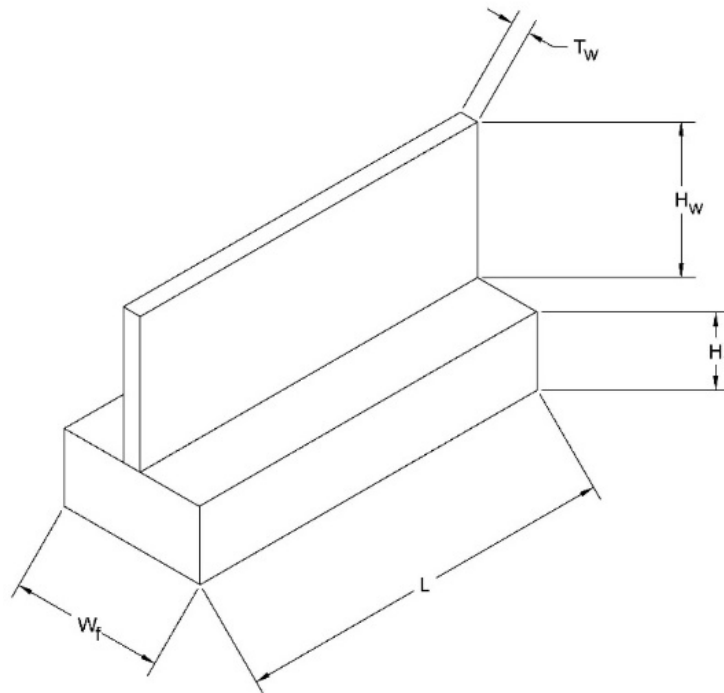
Simulation Model for Concrete Wall and Concrete Footing
